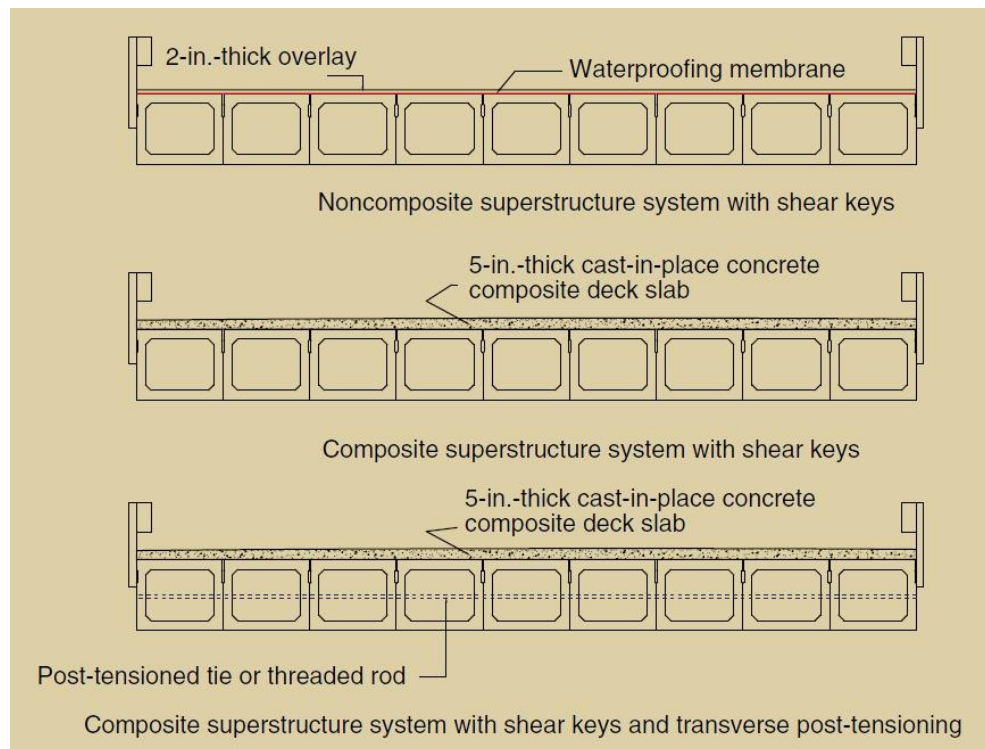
Various Practices in Adjacent Box Girder Bridge Design and Details (retrieved from Hanna et al., 2009)
